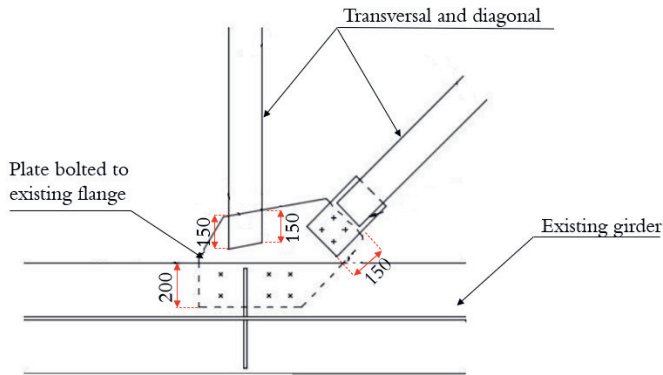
Additional solution to attach the bracing members of a K-shaped bracing.
